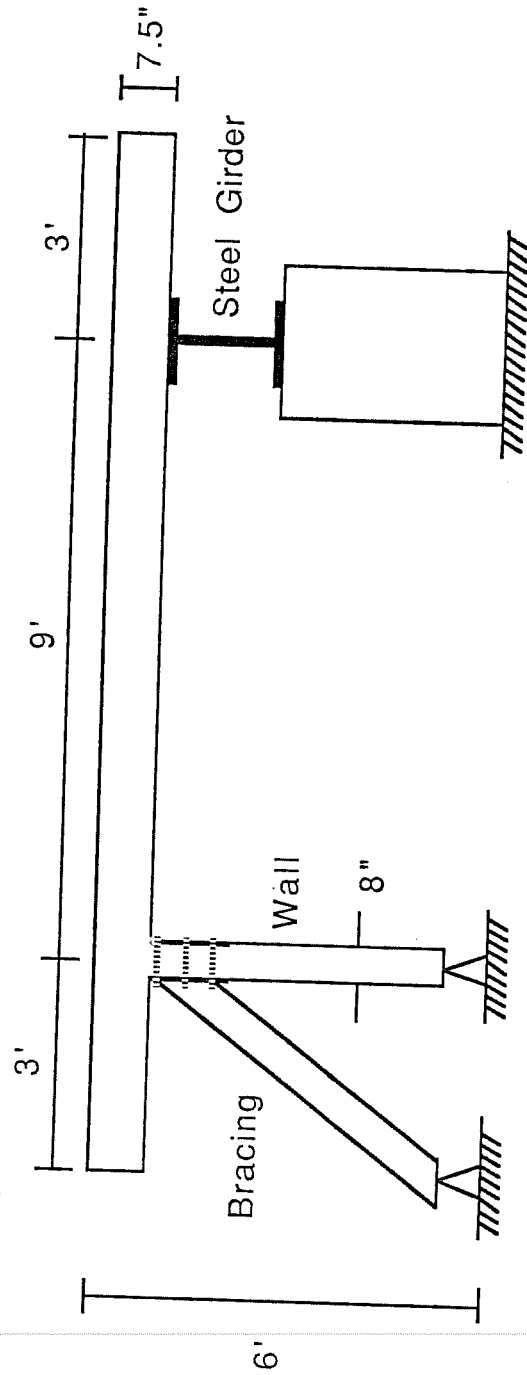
End elevation of skew bridge test specimen showing wall and lateral bracing
